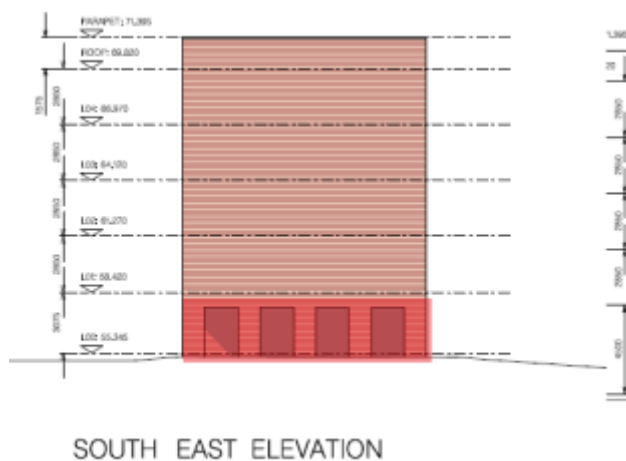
Corner Building Elevations predominantly facing towards Ashton Canal
